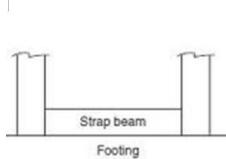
Combined footing [Strap beam may or may not be provided]
